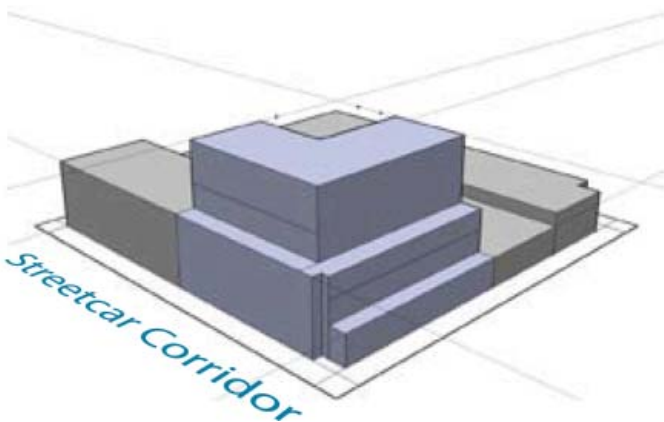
Streetcar corridor: 100 by 100-foot infill. 100 by 100-foot infill in Central Commercial zone (CX) at 75-feet in building height.
